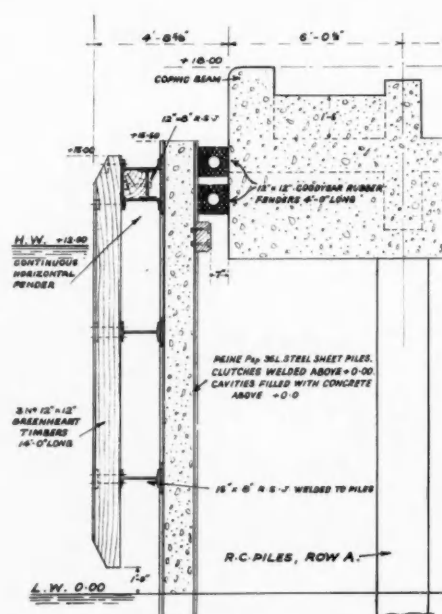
Sectional elevation of main fenders on Berth No. 11, Mombasa Harbour.
